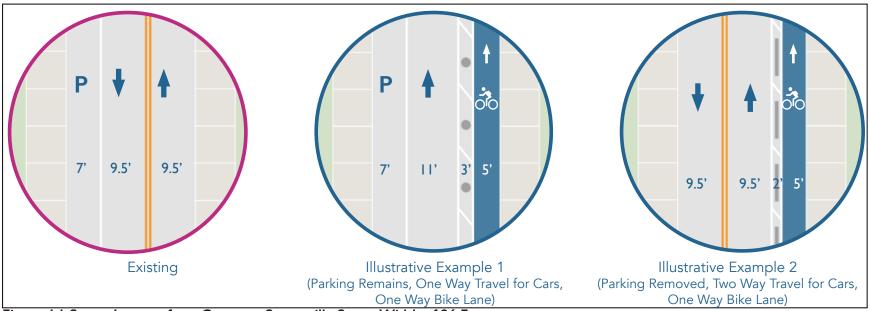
Street Layouts for a Common Somerville Street Width of 26 Feet
